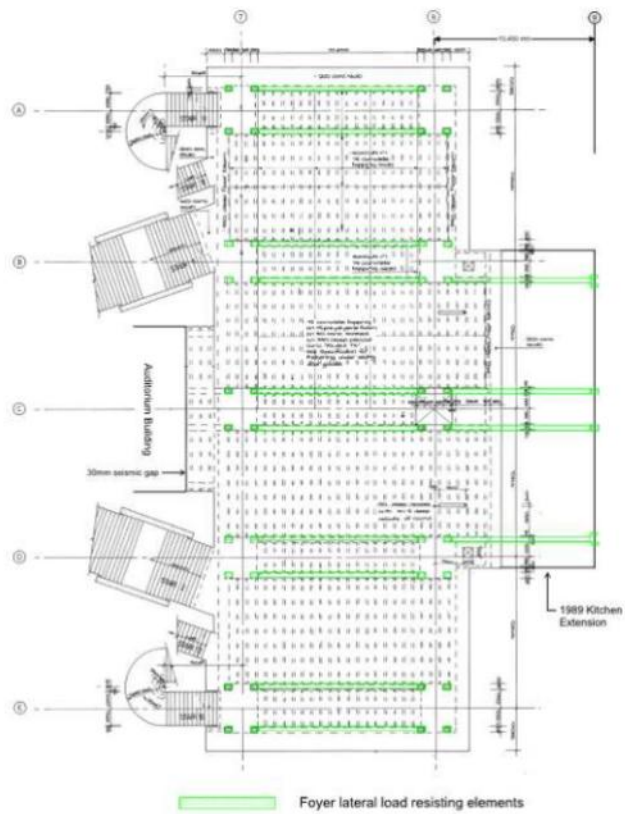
Foyer Plan, including 1989 Kitchen Extension
